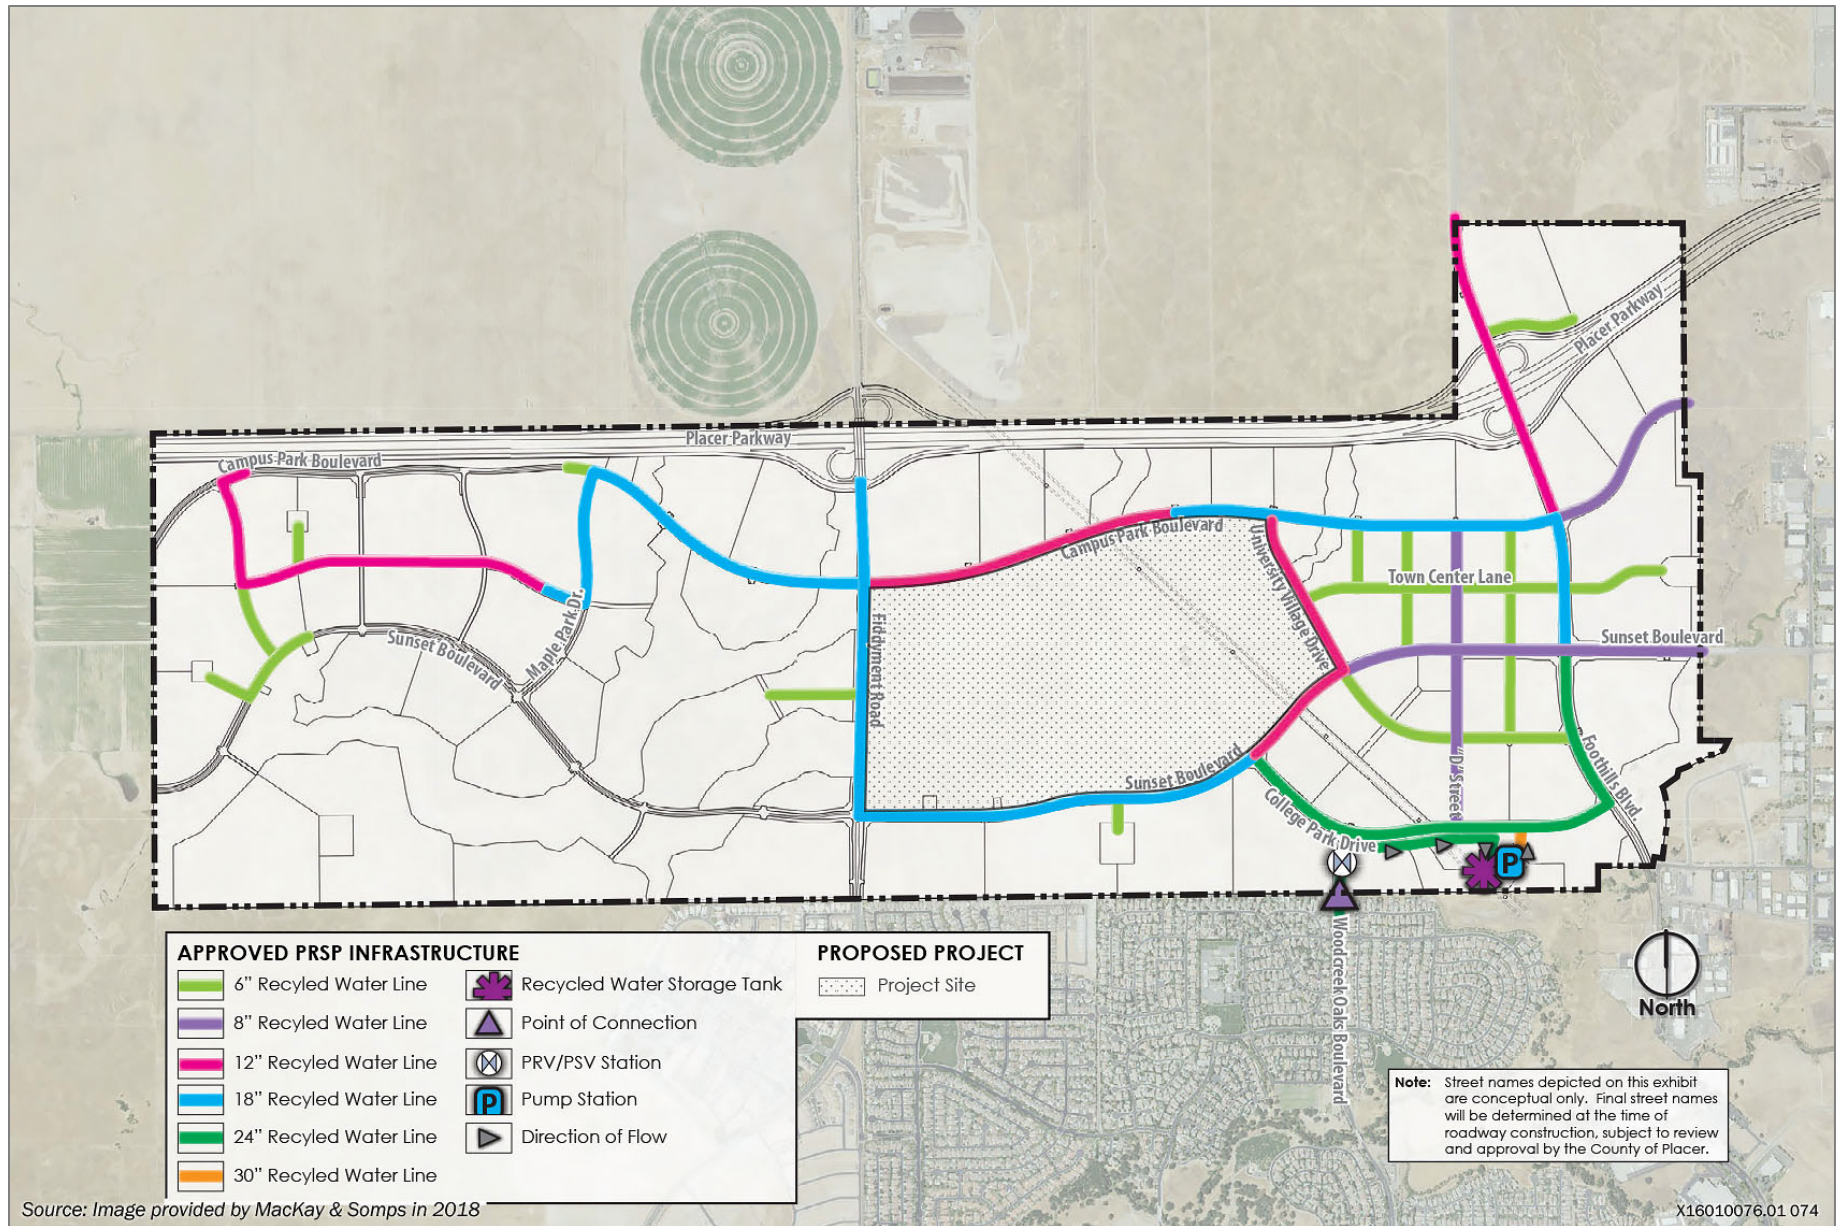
Placer Ranch Specific Plan Water Infrastructure
